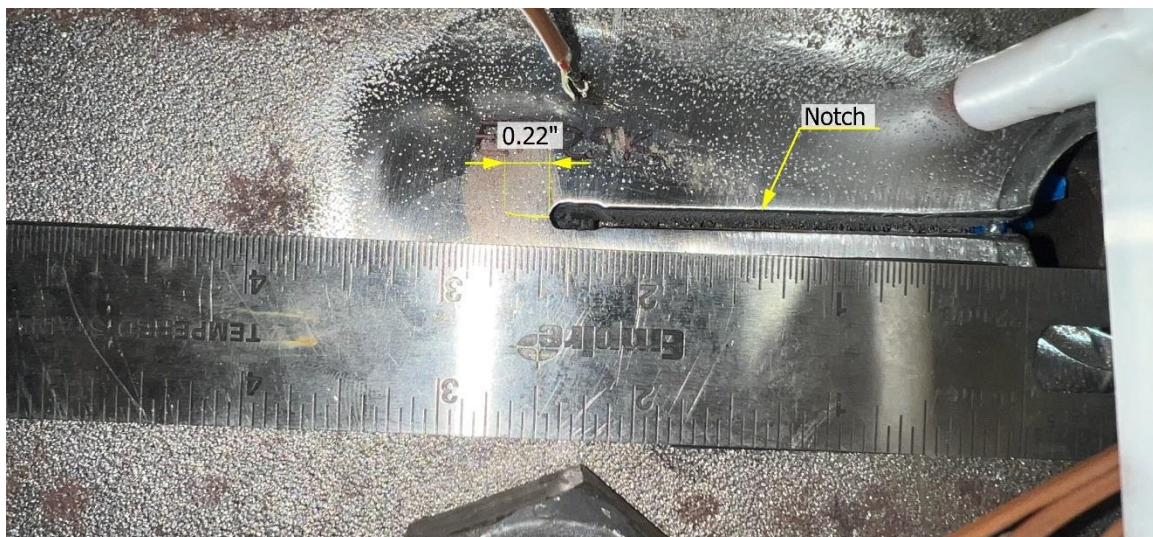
Specimen B2: fatigue cracks emanating from the notch on the East flange edge
